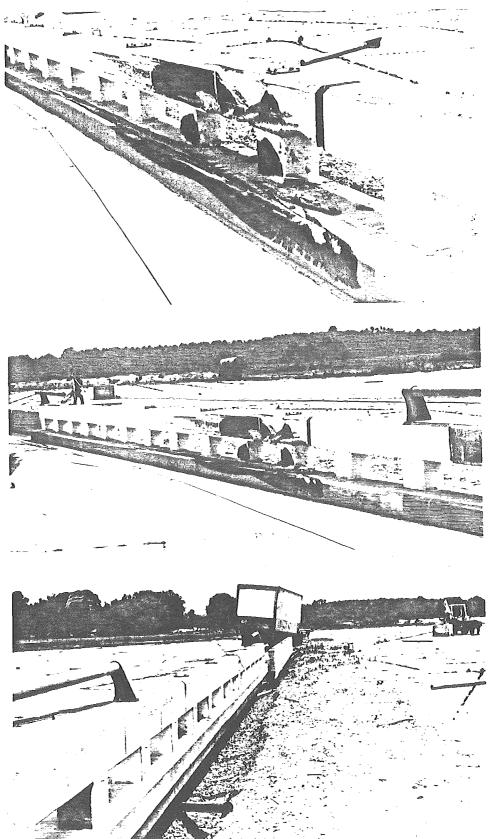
Posttest photographs of bridge rail system, test 1952-6-90.
